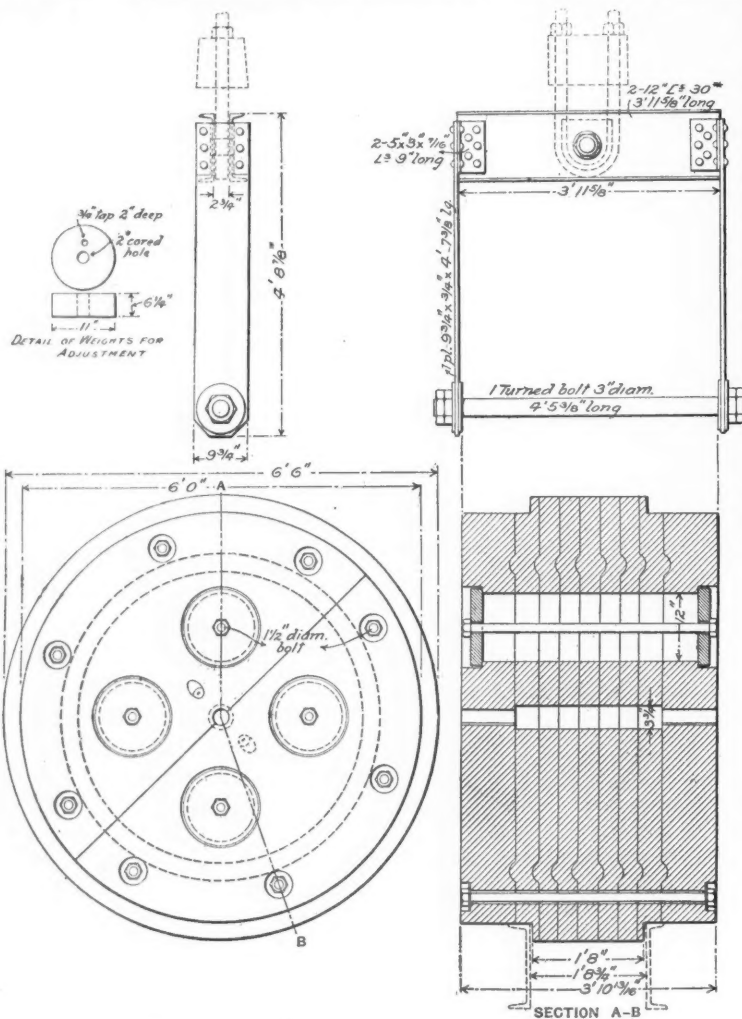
Details of Counterweights—Erie Lift Bridge.
